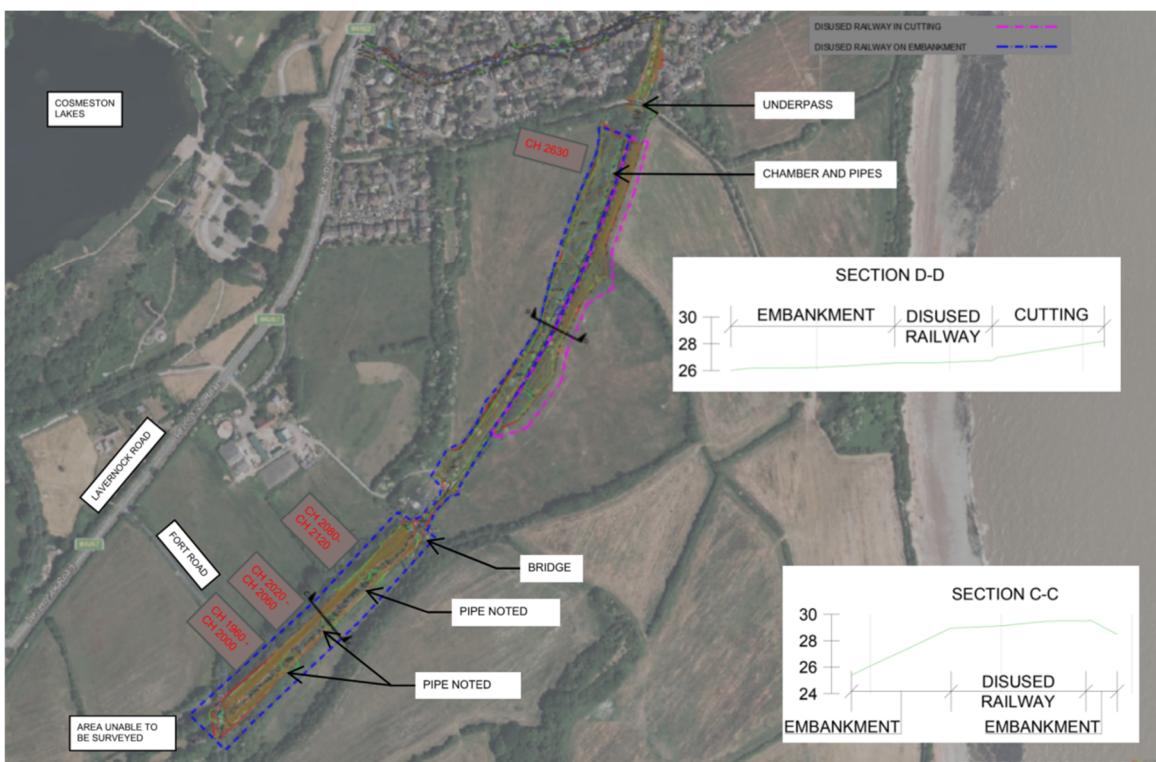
Central and Northern Section of disused Railway - Cutting and Embankment Locations
